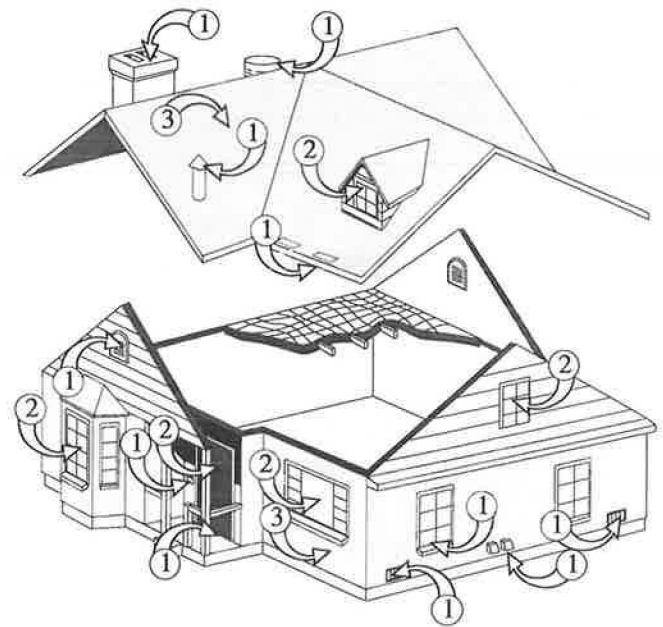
Major sound paths into typical residential construction: 1, air infiltration; 2, small building elements; 3, major building elements.
